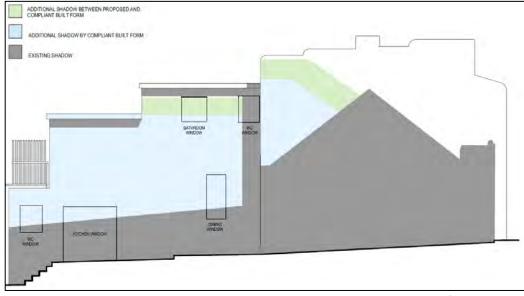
Overshadowing impacts at 12 noon to northern side elevation of 12 Rawson Avenue.
